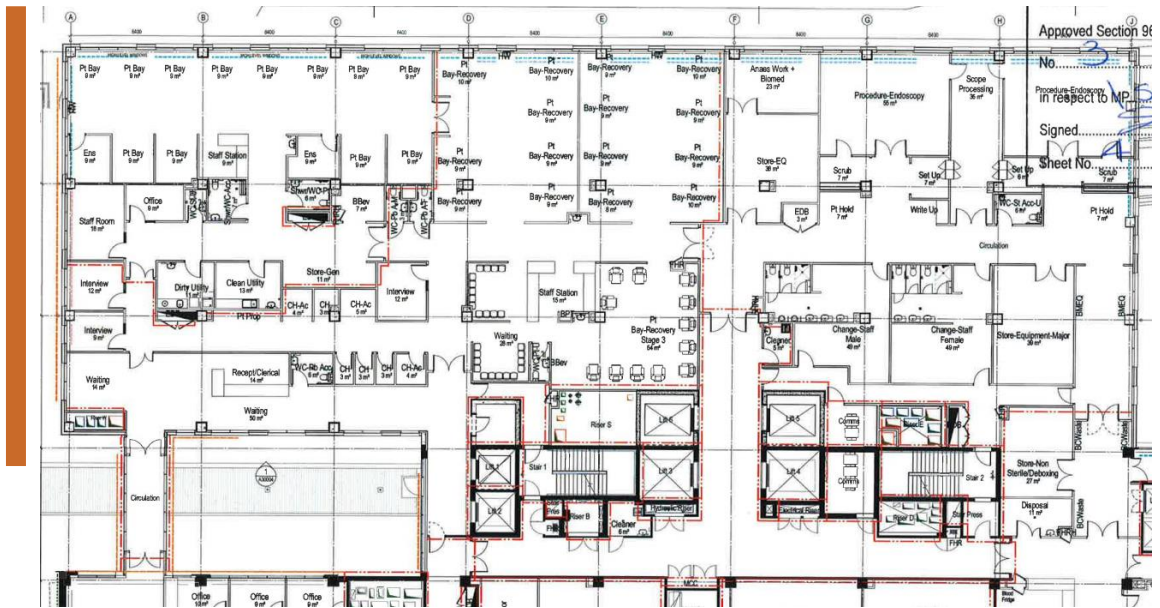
Approved Level 06 Floor Plan (Source: Woods Bagot)
